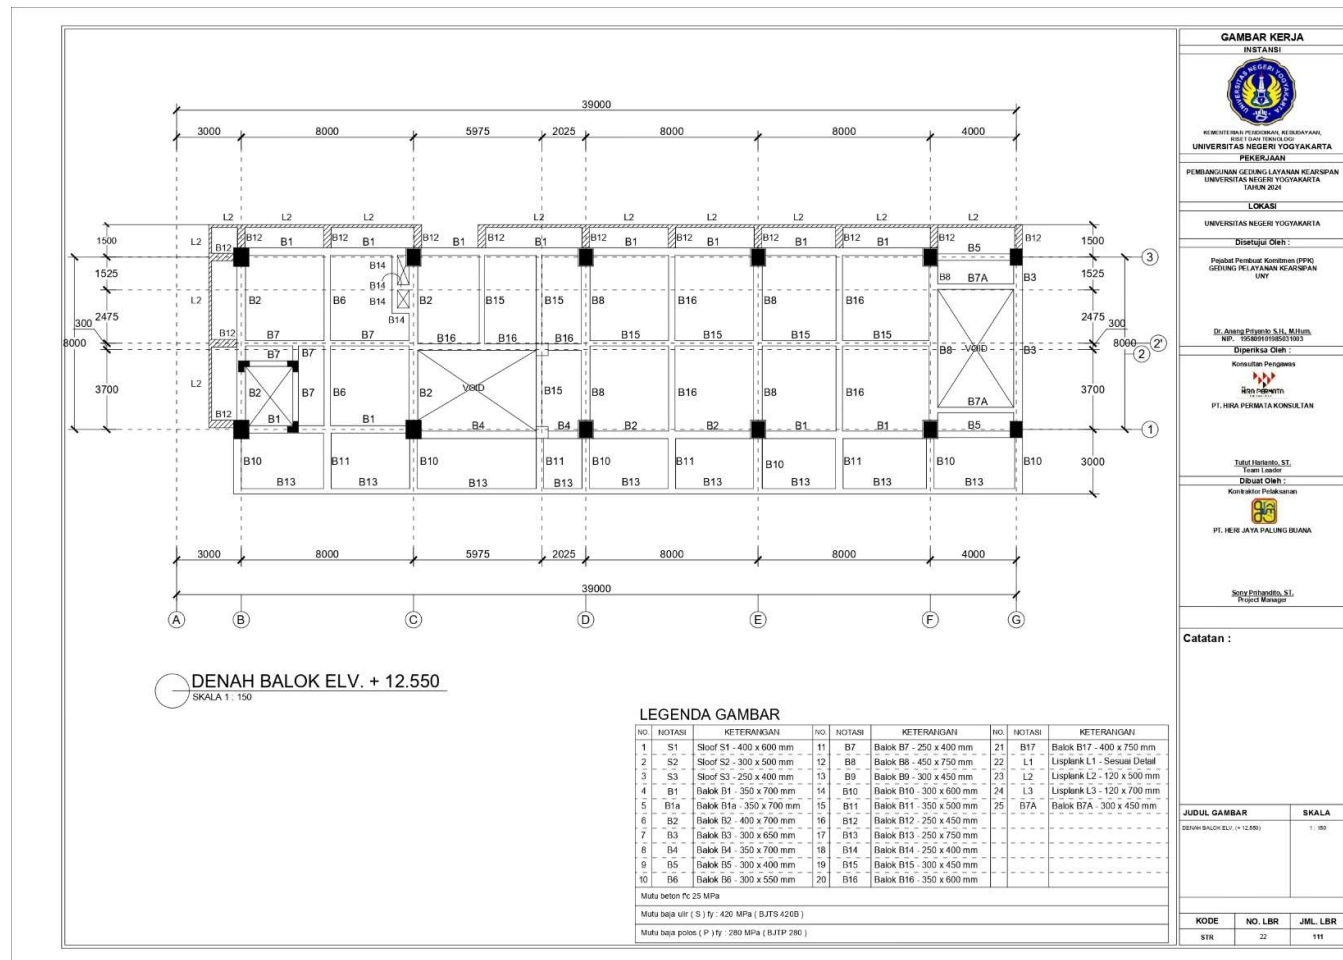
8 Beam Site Plan of Elv. +12.550
